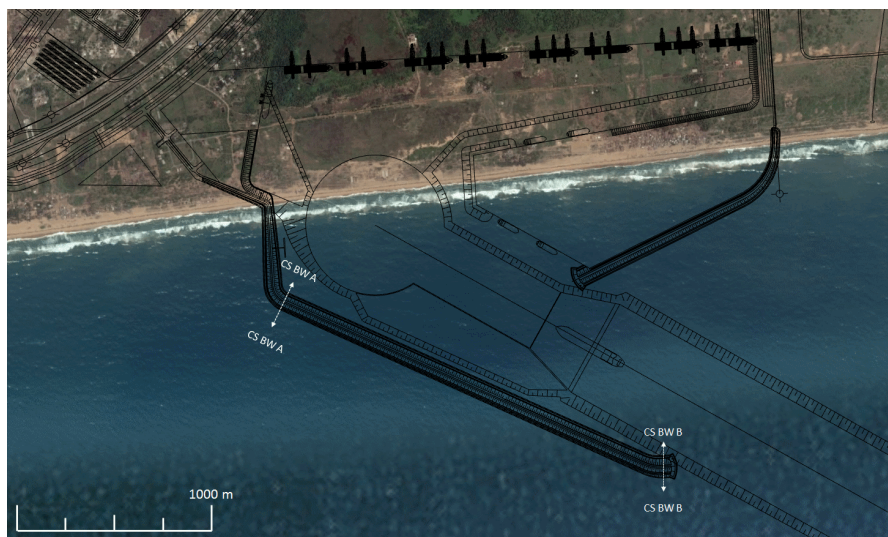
Overview of the conventional breakwater design with designated cross-sections along the breakwater.
